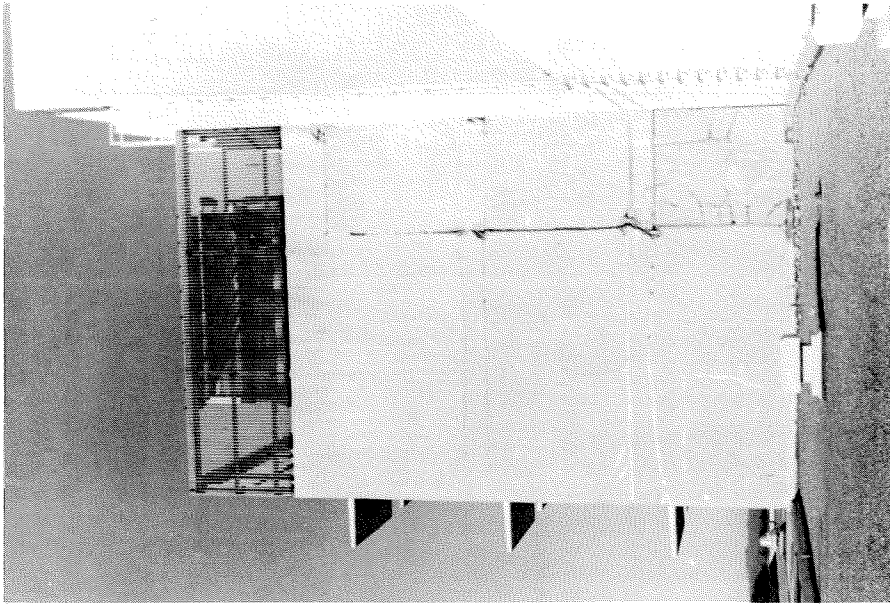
Cracking and spalling in the east shear wall of the three-story wing, Pacoima Lutheran Hospital.
